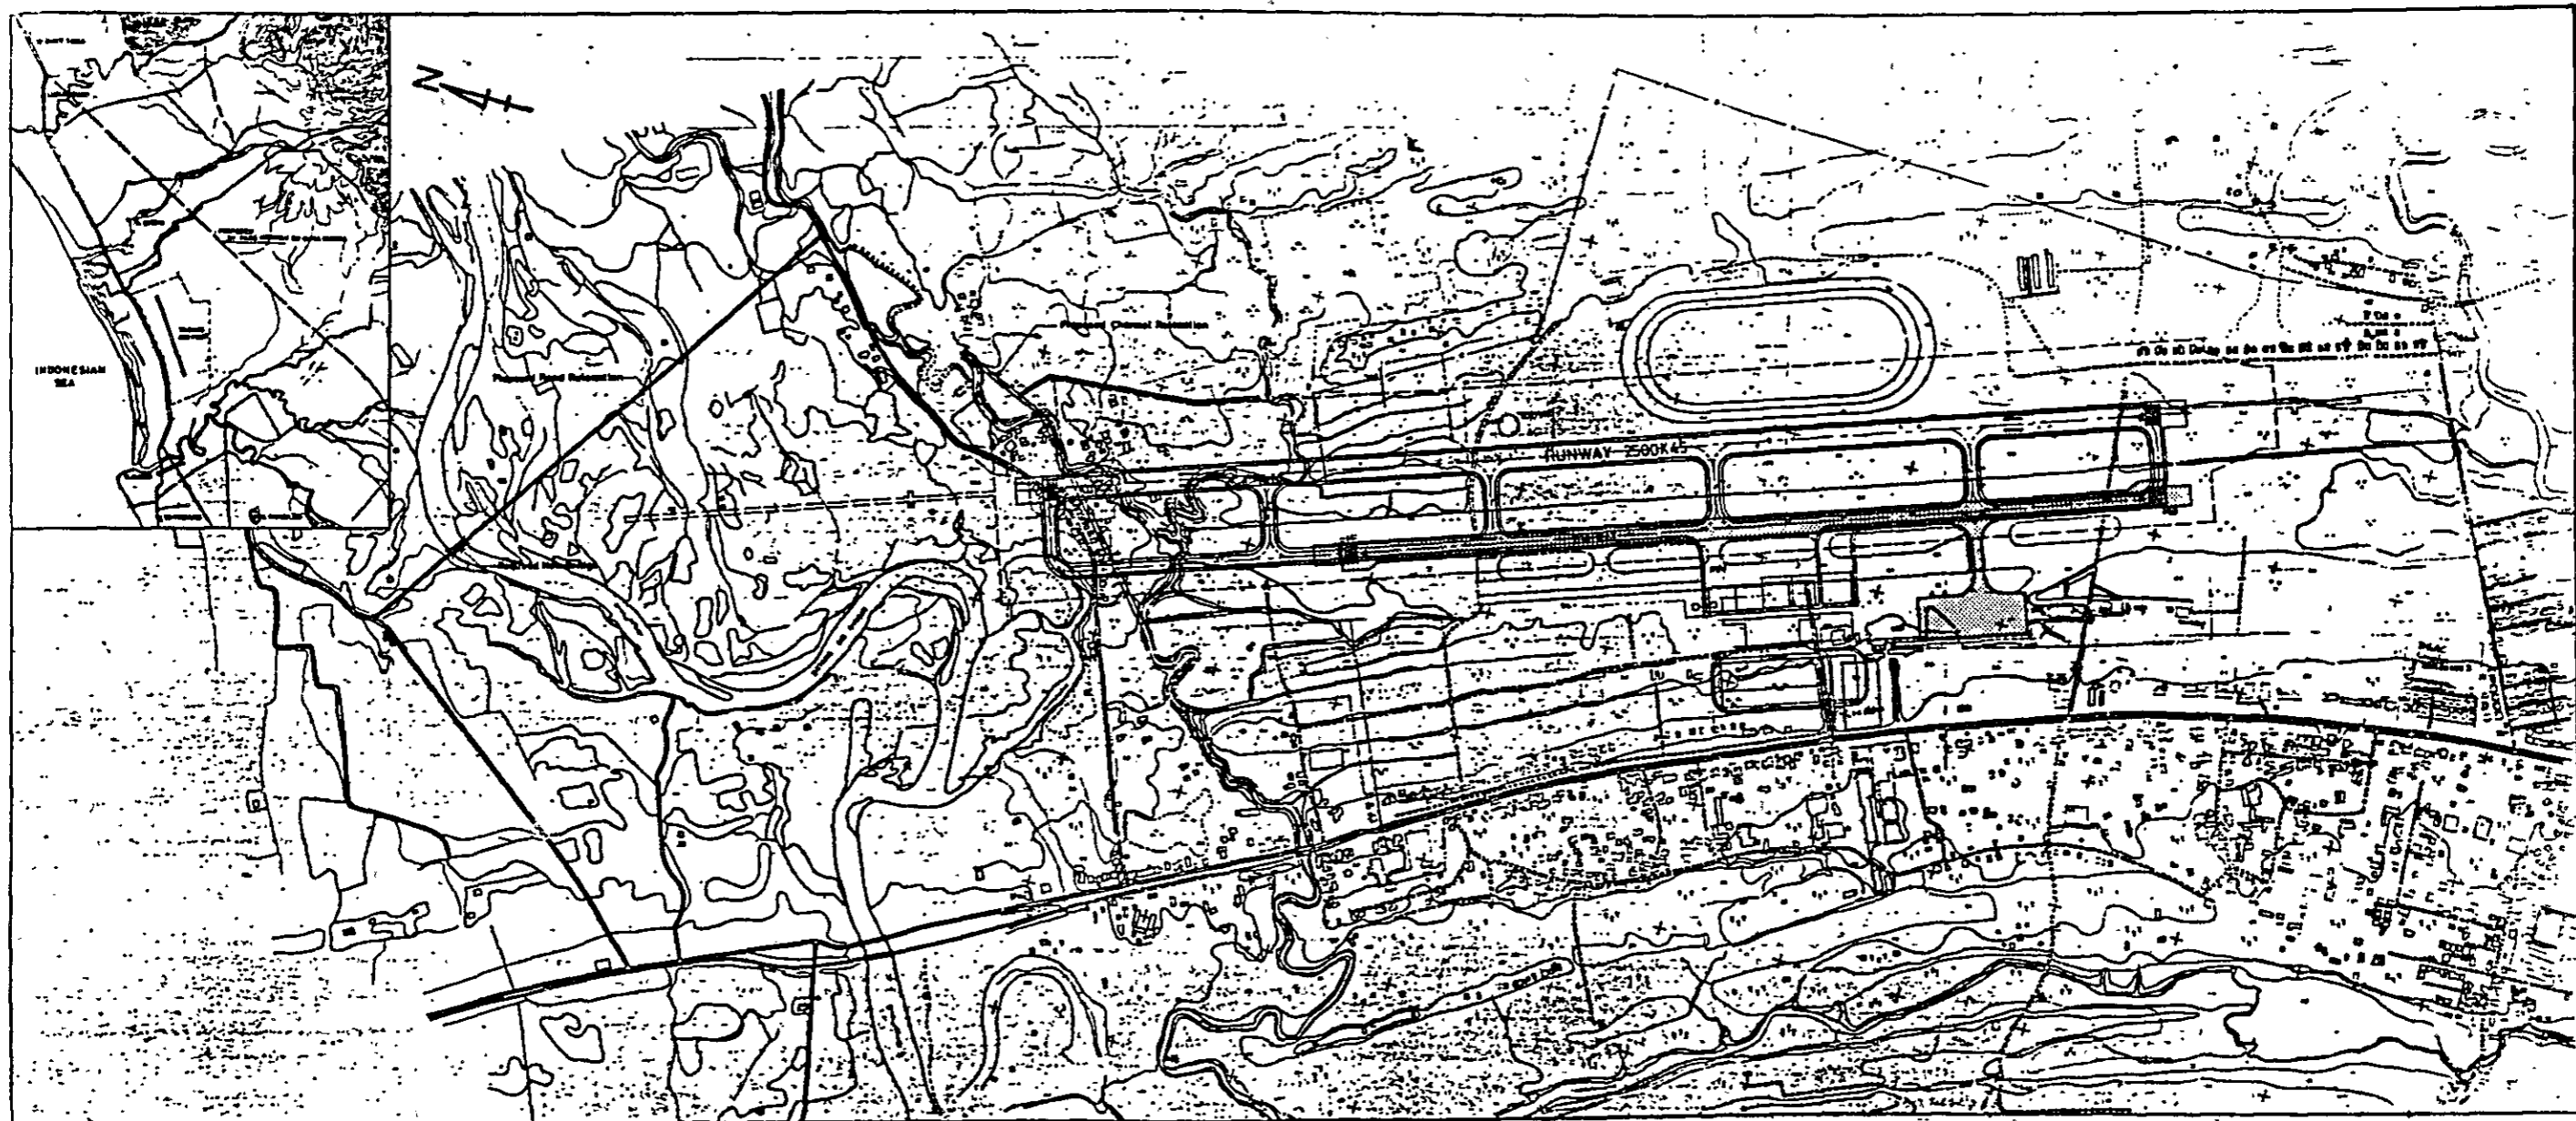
THE REDEVELOPMENT PLAN OF TABING AIRPORT
